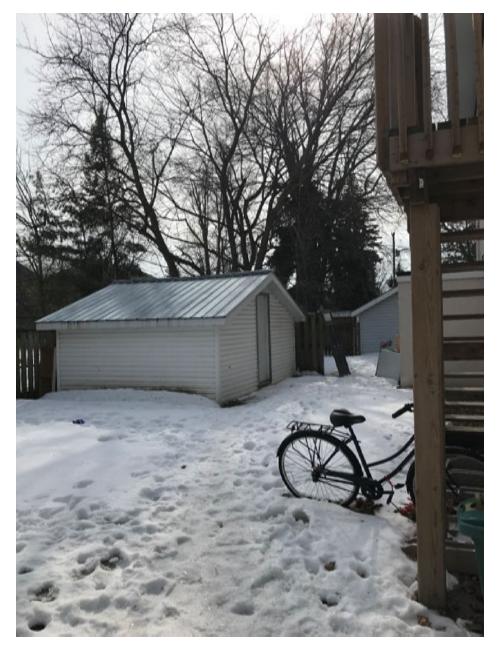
Existing rear yard and proposed location of bicycle parking shed.
